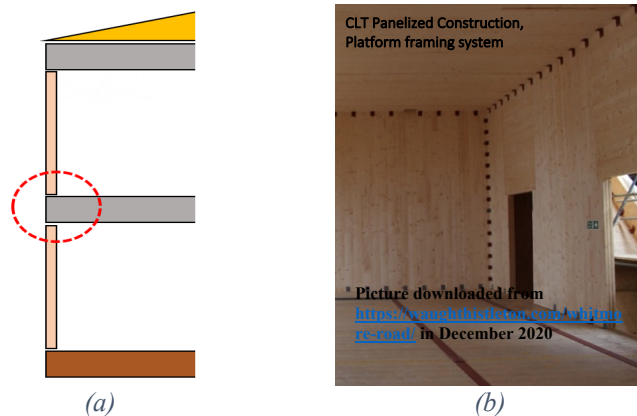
(a) Load bearing connection in platform framing system, (b) and its application in panelized construction.
